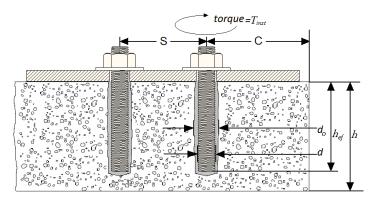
TYPICAL INSTALLATION DETAIL FOR THREADED RODS AND REINFORCING BARS
